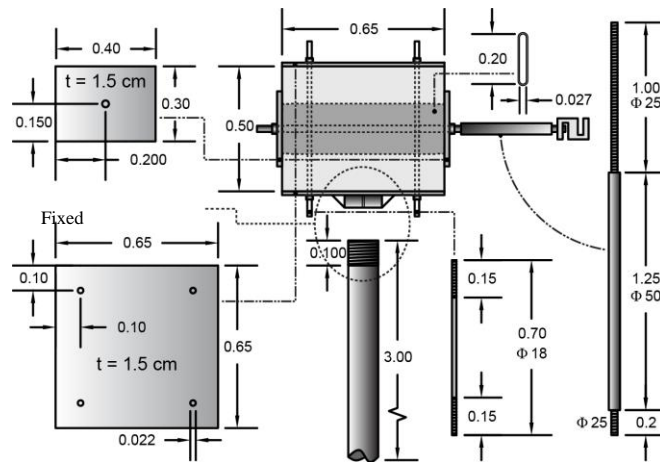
Cap Pile, Pile and Load Transfer Device for Connection Detailing
